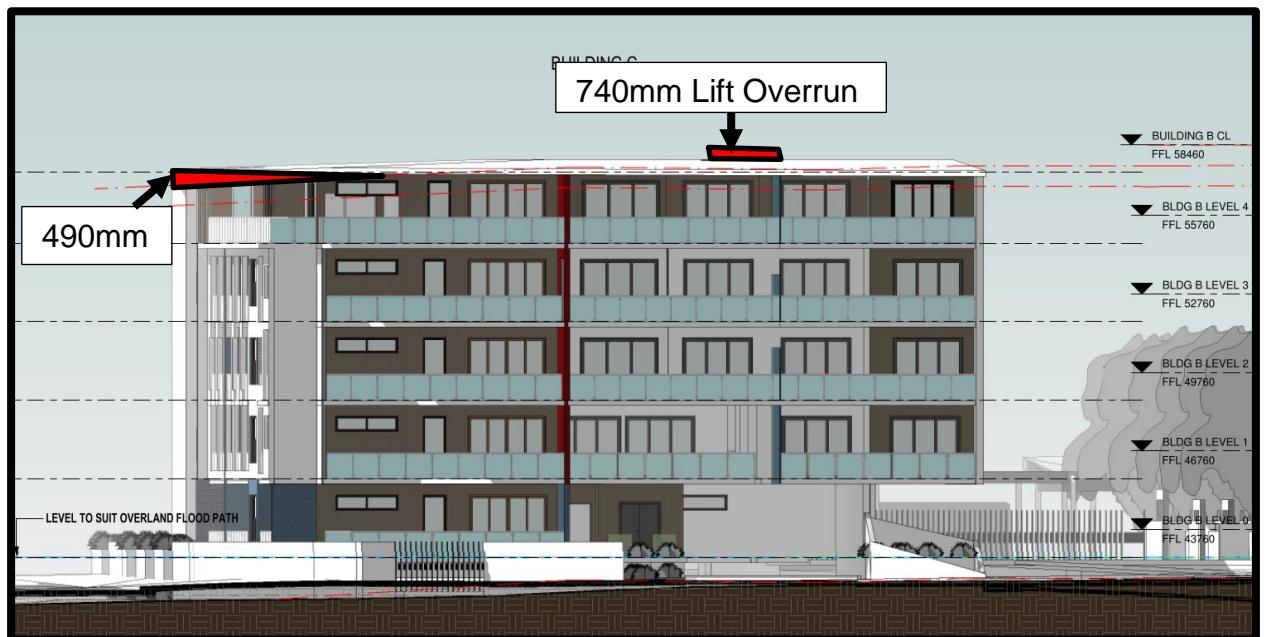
Height Exceedance from proposed FFL from south elevation Building C (post-fill)
